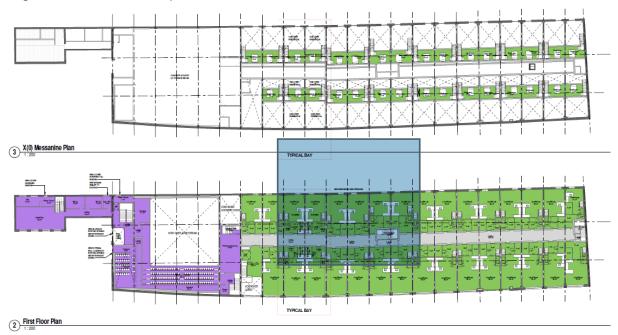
The first floor and mezzanine floor plans demonstrate the proximity of the live/work residential units to the performance and arts hall.
